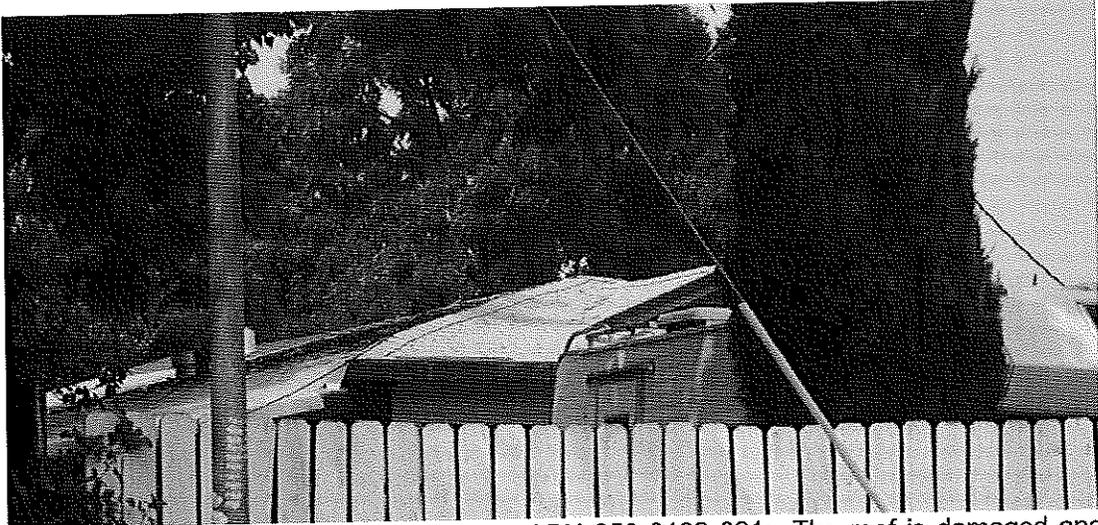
500 Block of South Avenue, APN 250 0102 021: The roof is damaged and rotting, creating a safety hazard for residents.
